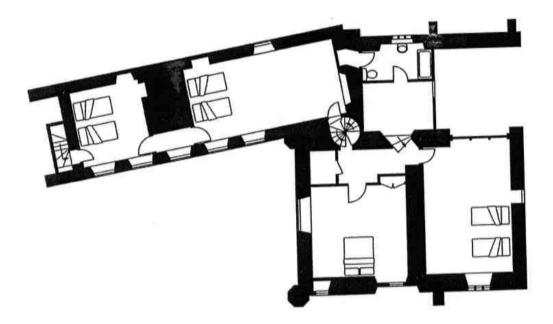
1st floor plan with current Landmark Trust room arrangements.
